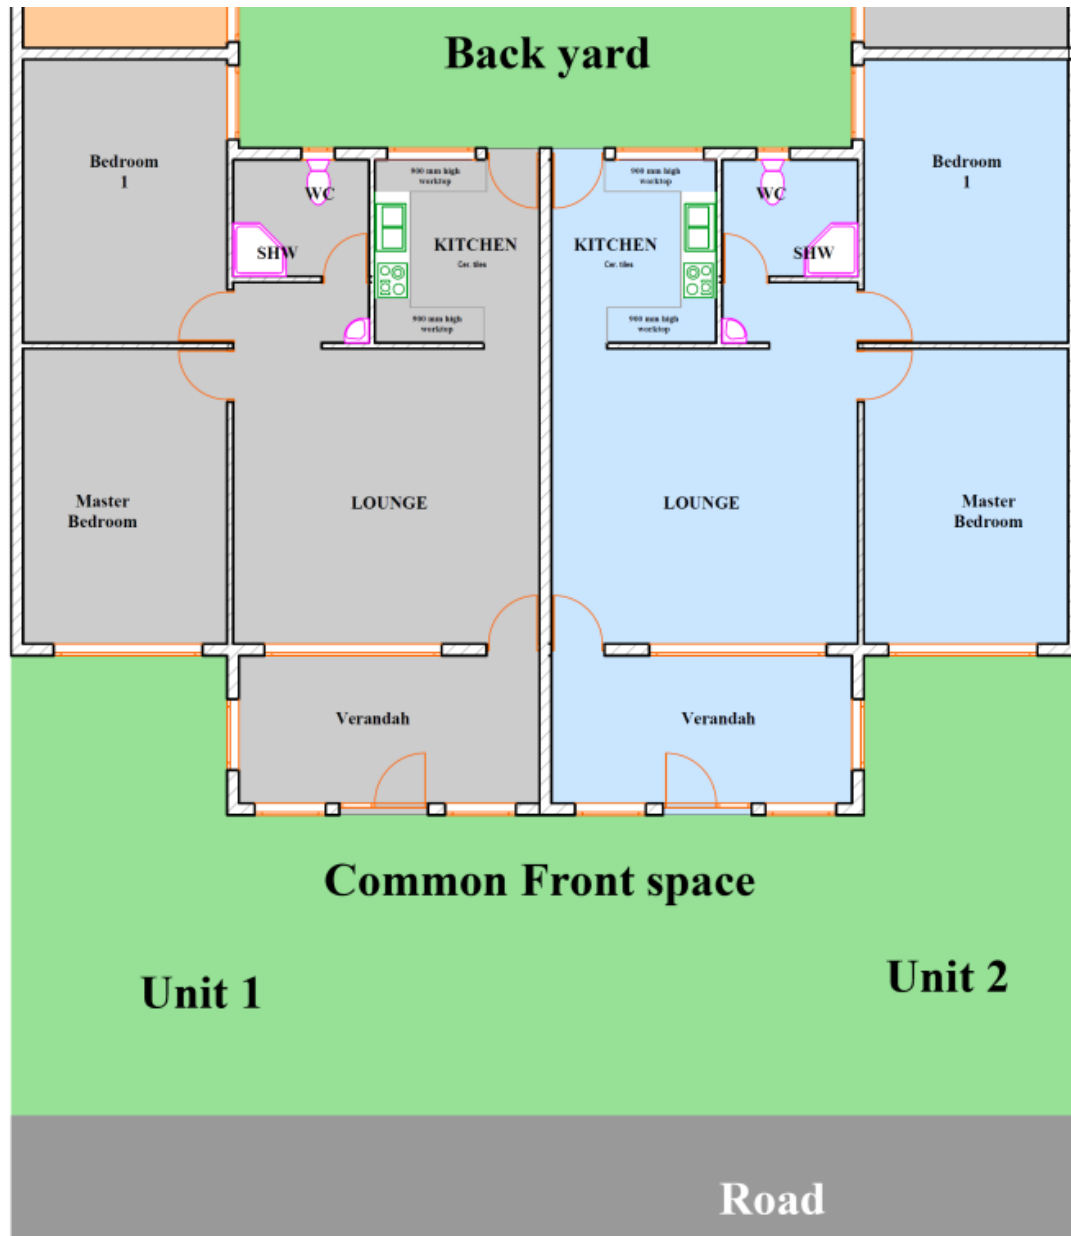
Typical building layout plans for comprehensive development plans for informal settlements (Source: Author, 2014).
